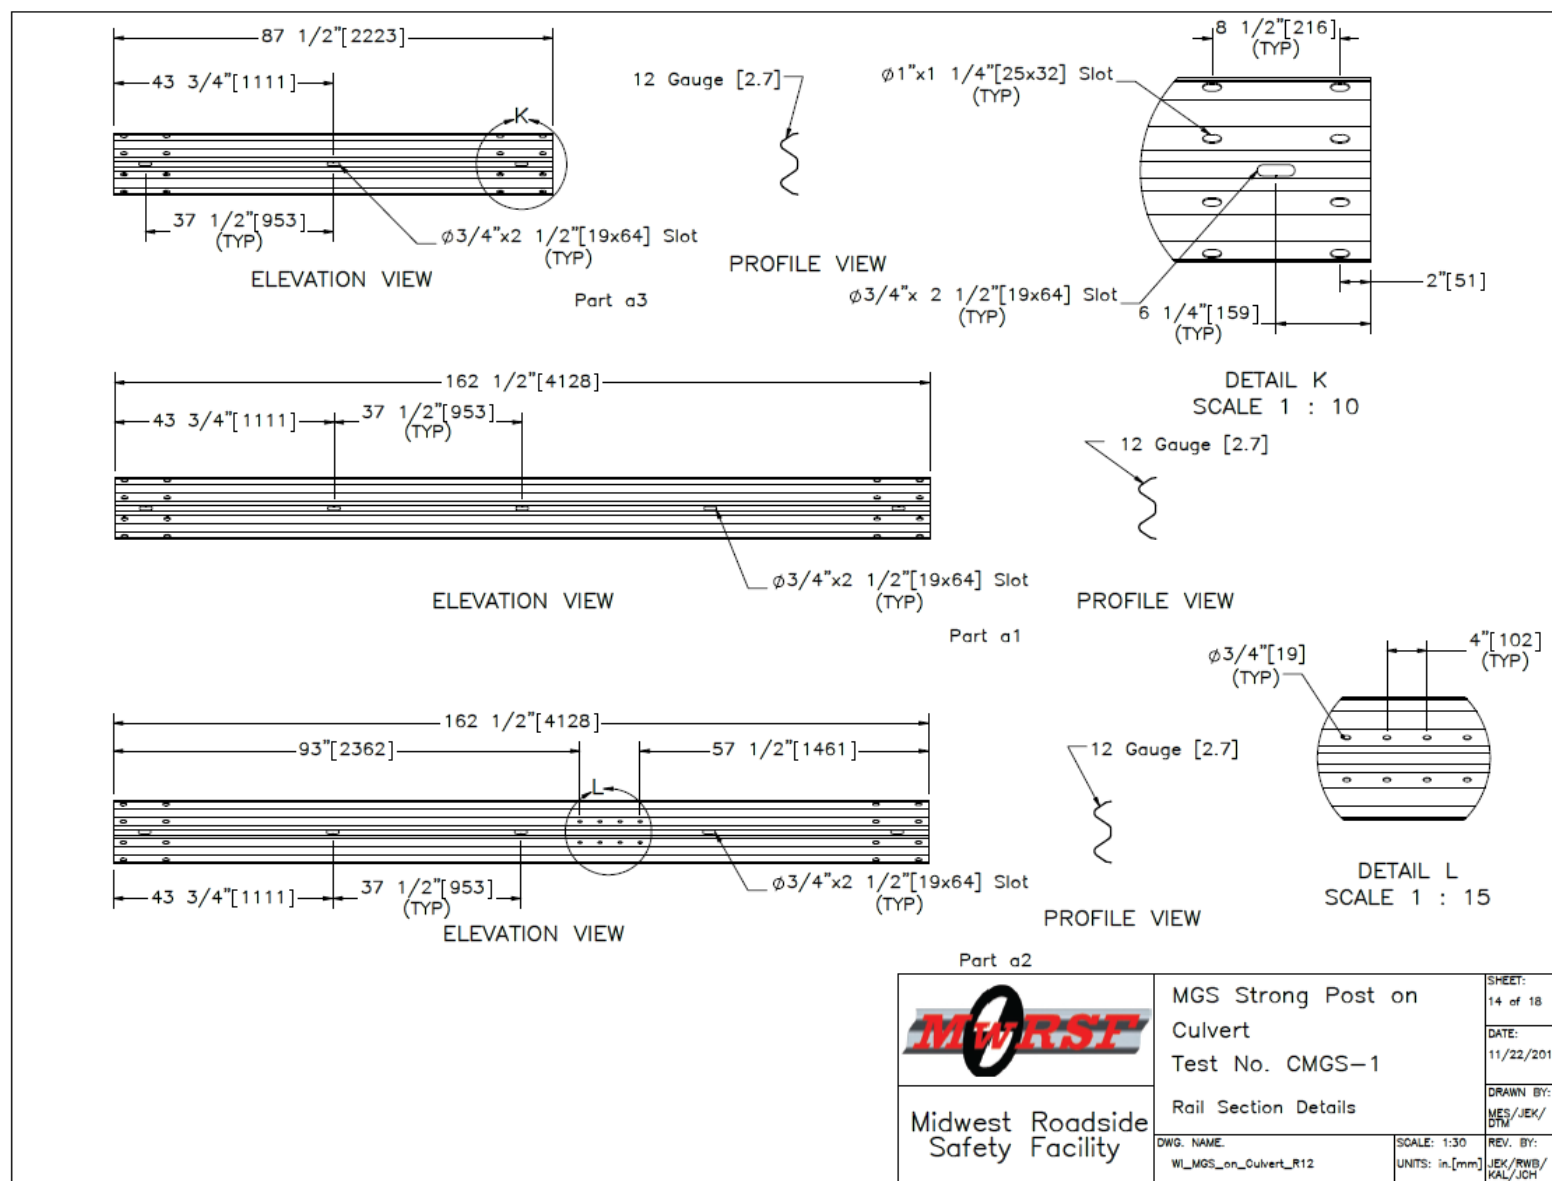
Rail Section Details, Test Nos. CMGS-1 and CMGS-2
